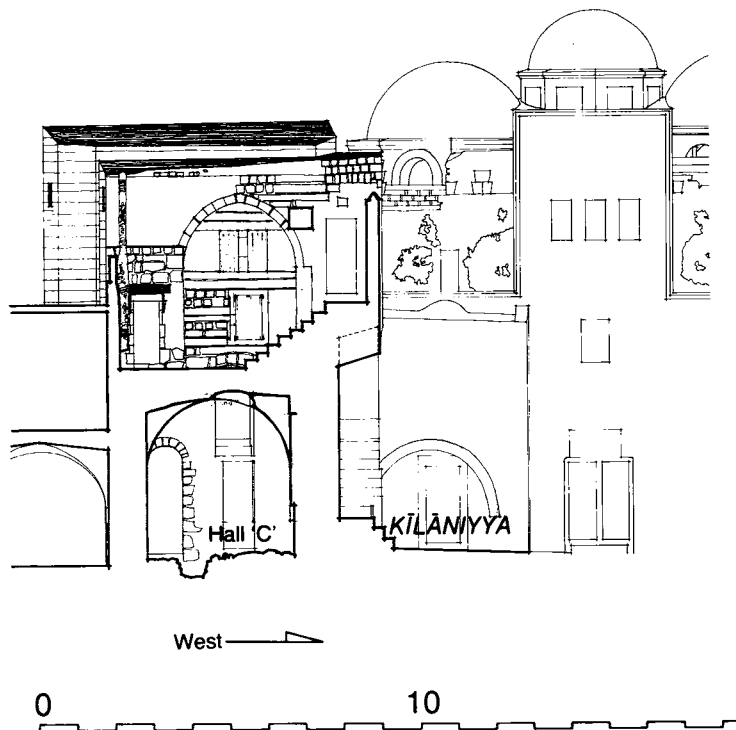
East–west section through courtyard and hall 'C' looking south
